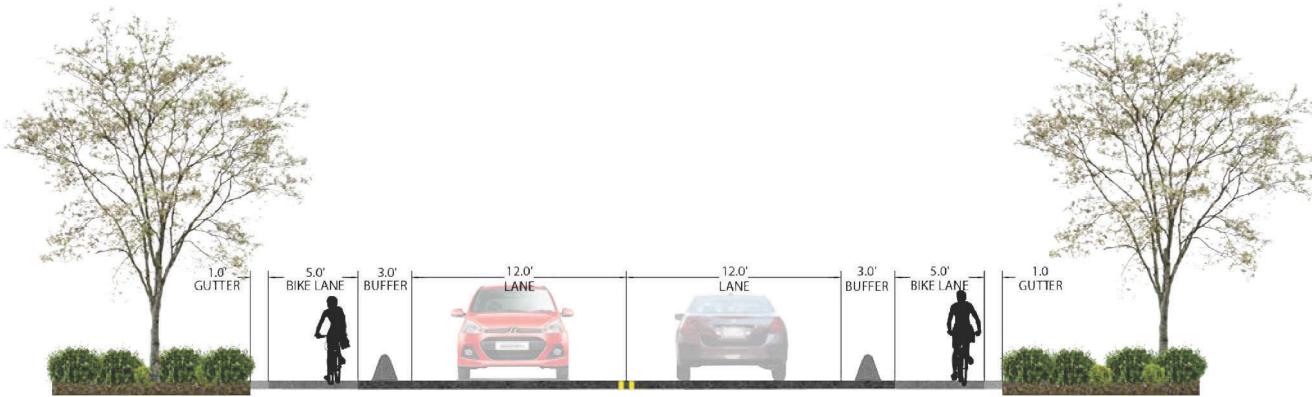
East Jordan Canal Trail typical sections of protected bike lanes on South Union Ave from 900 E to Creekview Apartments.
